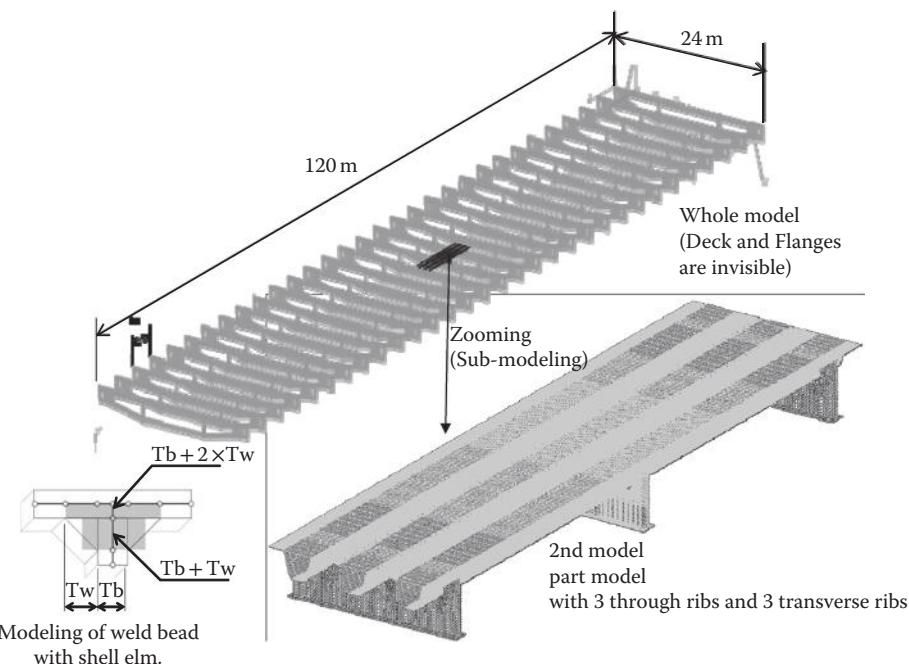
Finite element method models for study on orthotropic steel bridge decks for Tokyo Gate Bridge.
